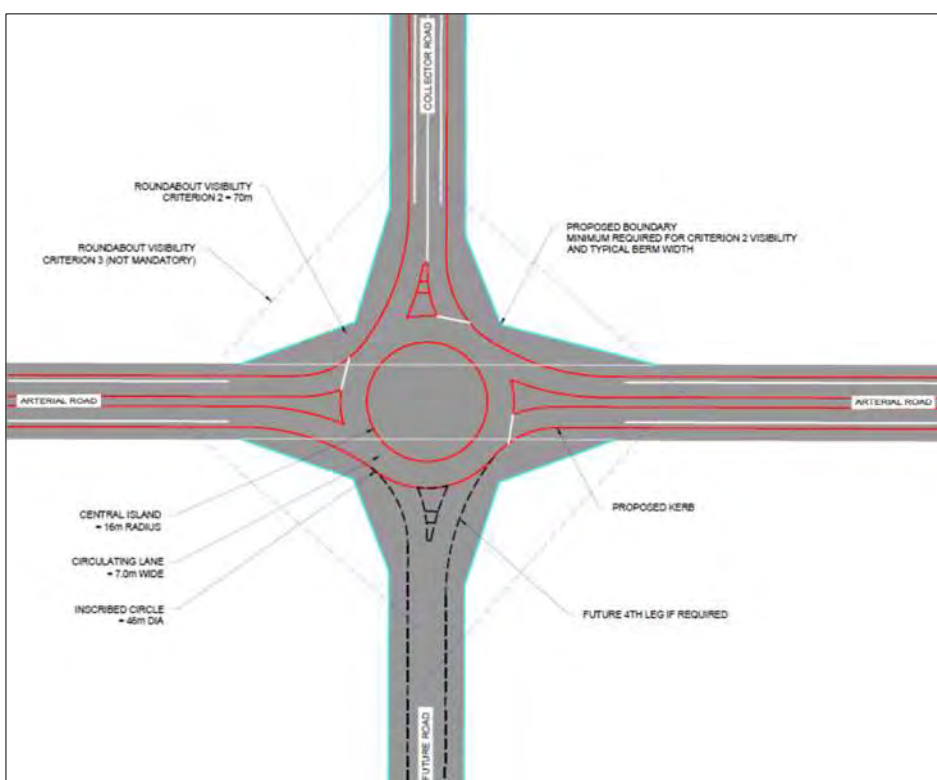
Typical arterial/collector road roundabout (also refer to Appendix 2)
